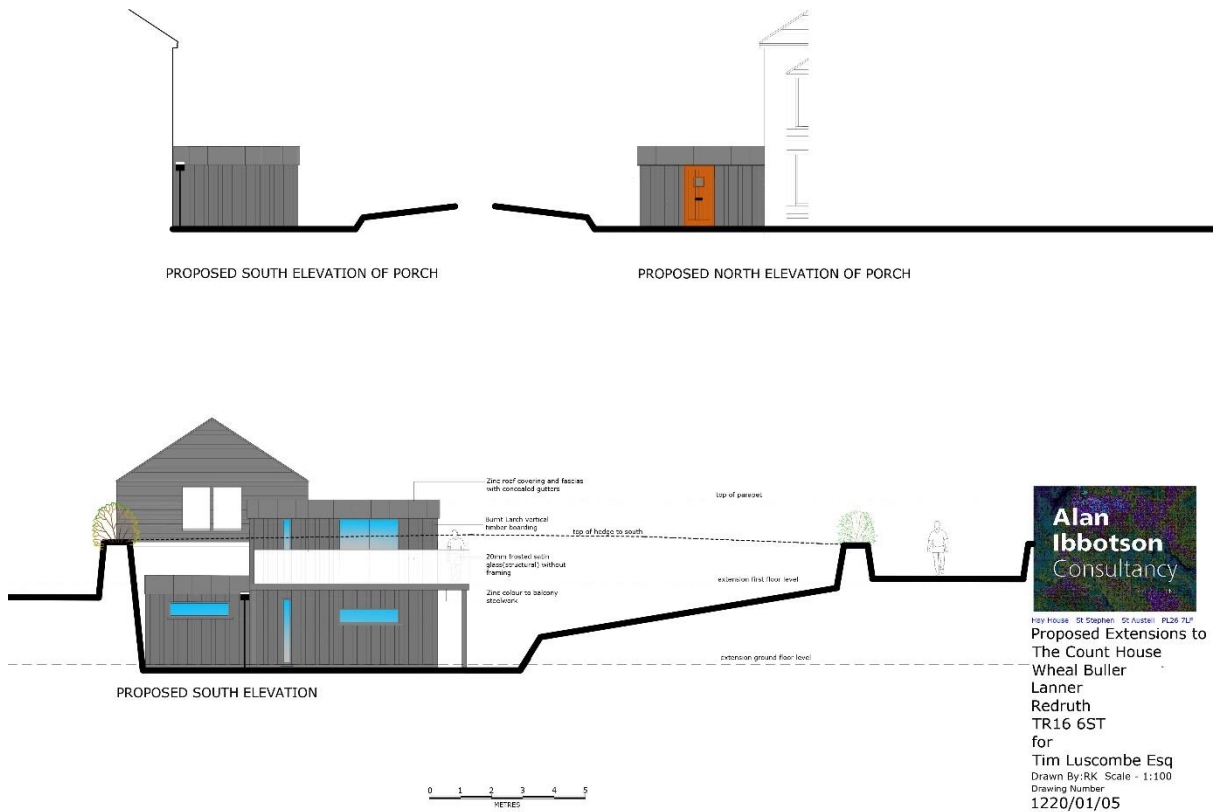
South and north elevations showing alternative proposals for porch and south elevation showing alternative proposals for new extension (design 2).
